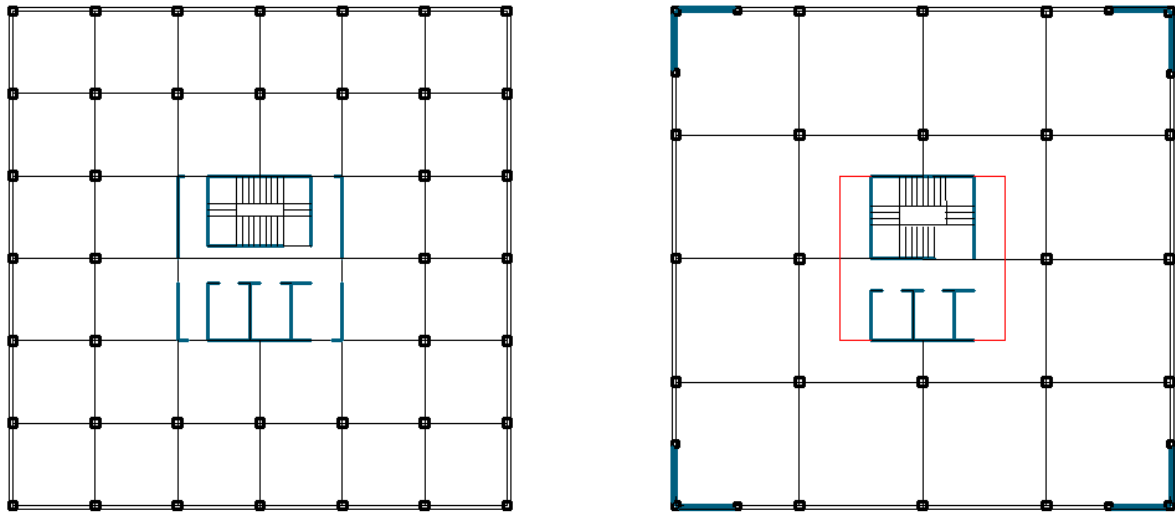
Quadratic building configuration with plan dimension 24x24m: left – structural plan with a dense grid of columns and with enlarged service core in the center; right – structural plan with eight perimeter perforated structural walls 3m wide with an enclosed service core in center and with a grid of enlarged columns (source: the author)
